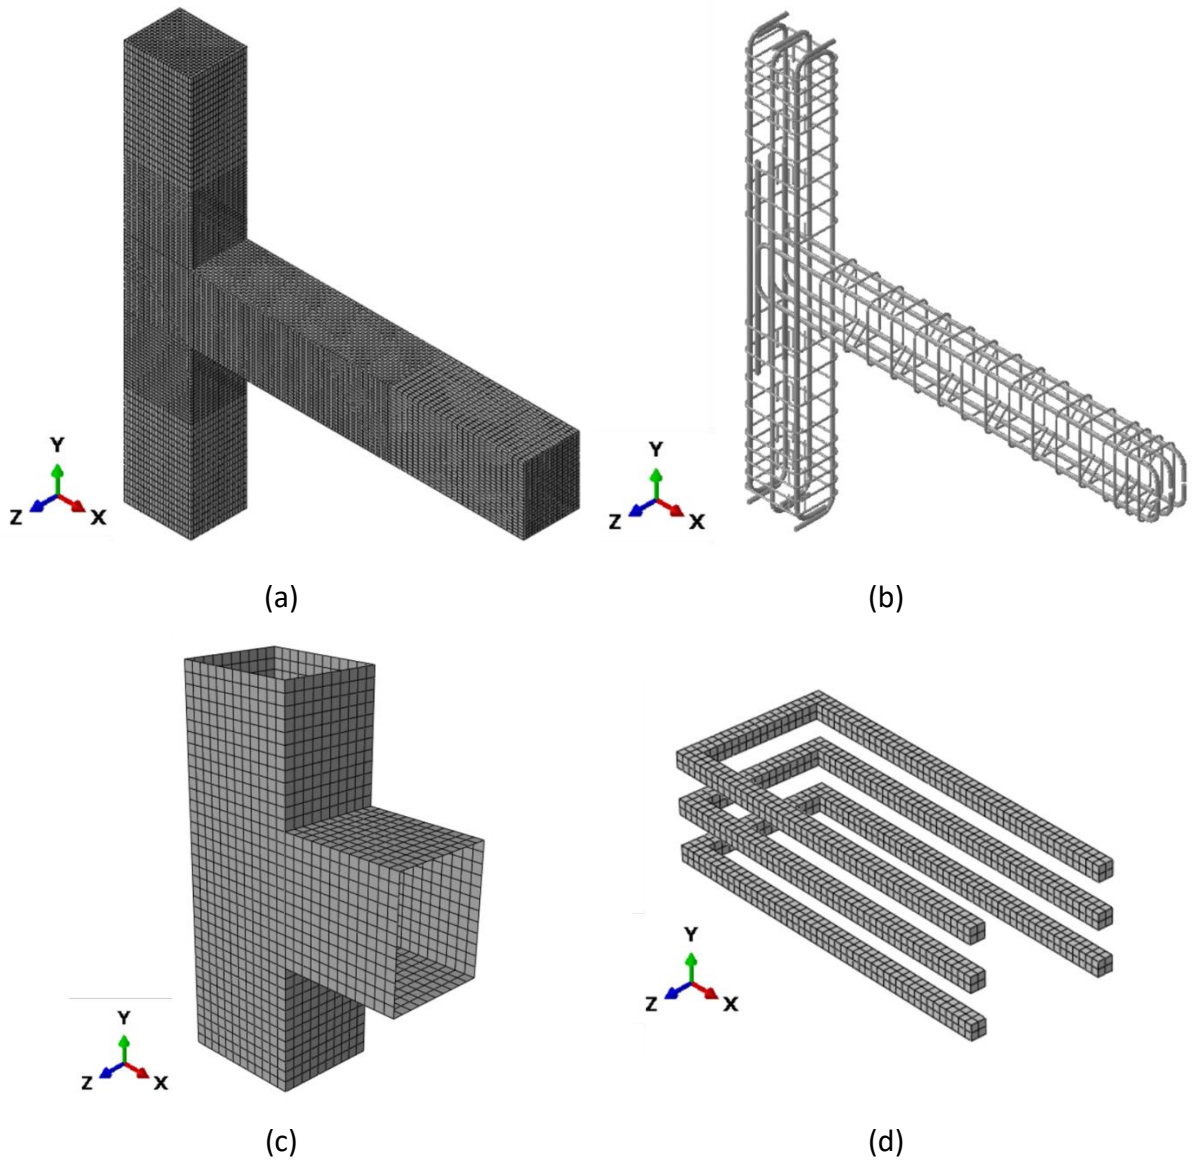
Modelled specimens: (a) Concrete elements mesh; (b) Reinforcement details of joint; (c) FRP sheet element mesh; (d) Epoxy adhesive element mesh.
